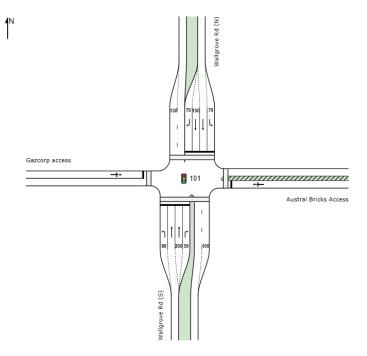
Wallgrove Road / Austral Bricks Road – Gazcorp Industrial Estate 2021 layout
